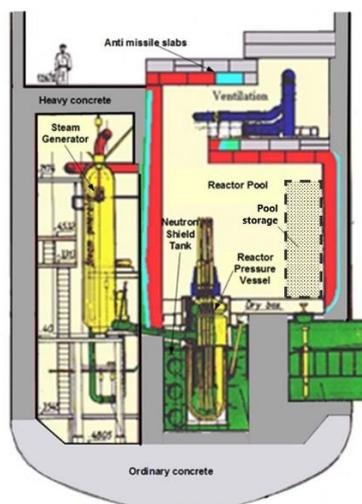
Cross section of the BR3 reactor building during exploitation showing the main components. The building structure is mainly composed of reinforced ordinary concrete (bottom plate) and reinforced heavy concrete (upper structure). The activated concrete is marked in red colour (first rough estimation).
